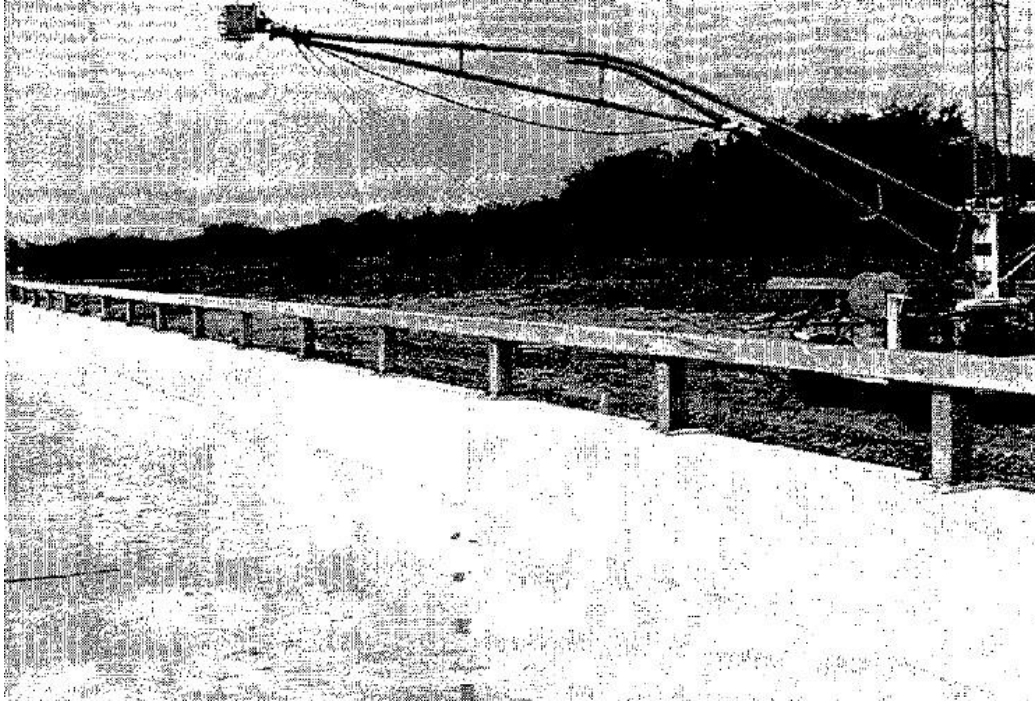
BR27C Bridge Railing on Bridge Deck [9]
